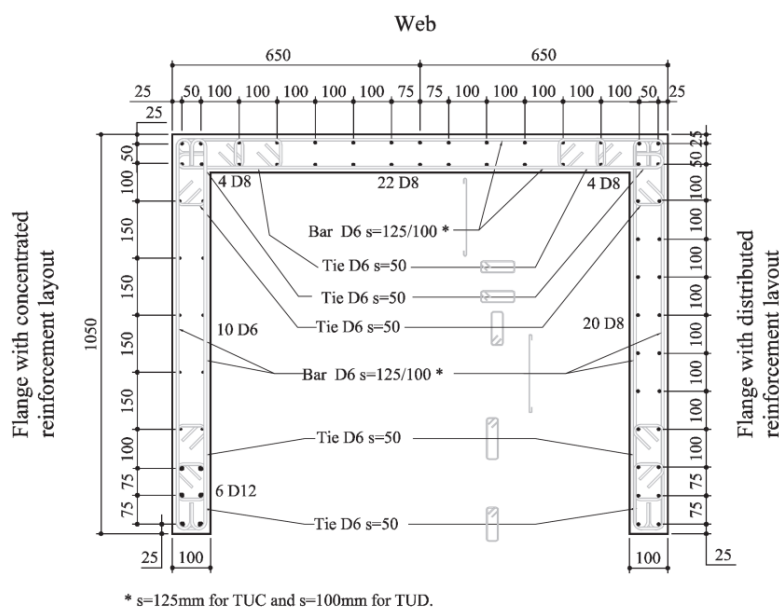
cross-section and reinforcement layout of the test units (Constantin and Beyer 2016)
